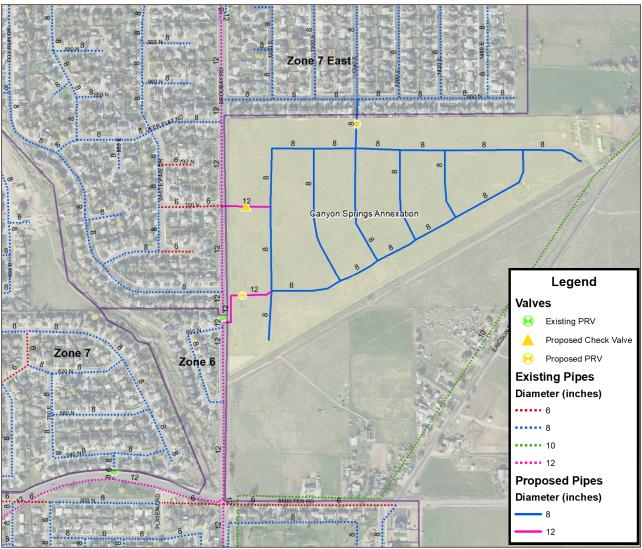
DEVELOPMENT LOCATION AND DRINKING WATER SYSTEM PIPE SIZE
